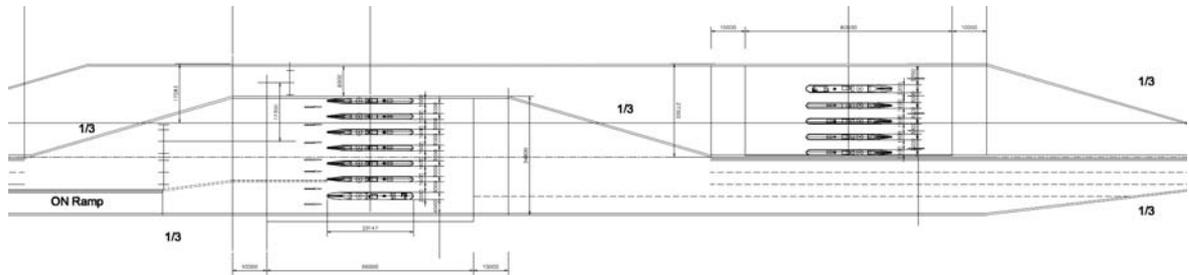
LAYOUT OF TOLL BARRIER
